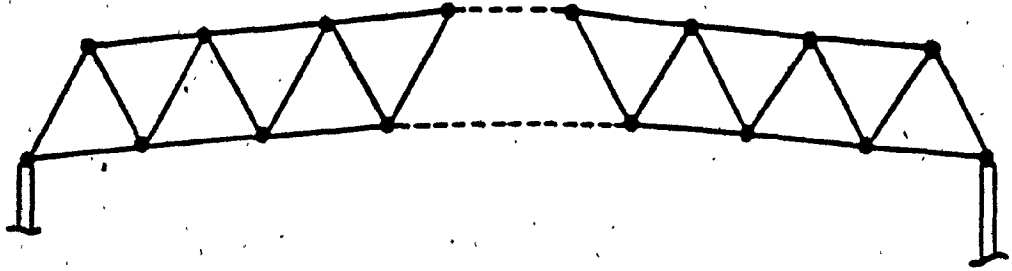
PROFILE OF A RING TRUSS WITH EIGHT EQUALLY SPACED RINGS. THE TRUSS IS SUPPORTED AT ITS LOWER SURFACE, AND SLOPES UPWARDS FROM THE COLUMNS TO THE CENTER. THE DEPTH OF THE TRUSS IS CONSTANT.
